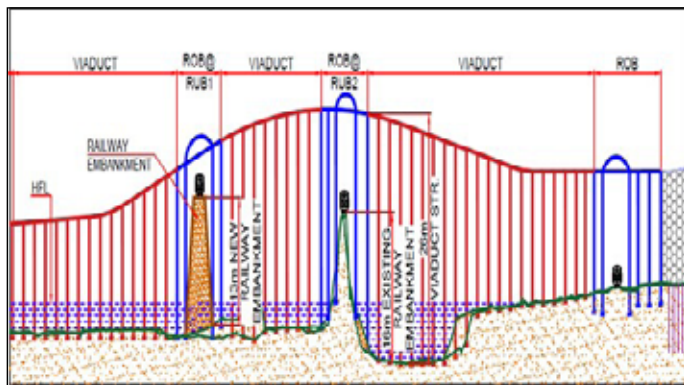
ROB Proposals Passing over Railway Tracks with Viaduct Structures in Approaches
